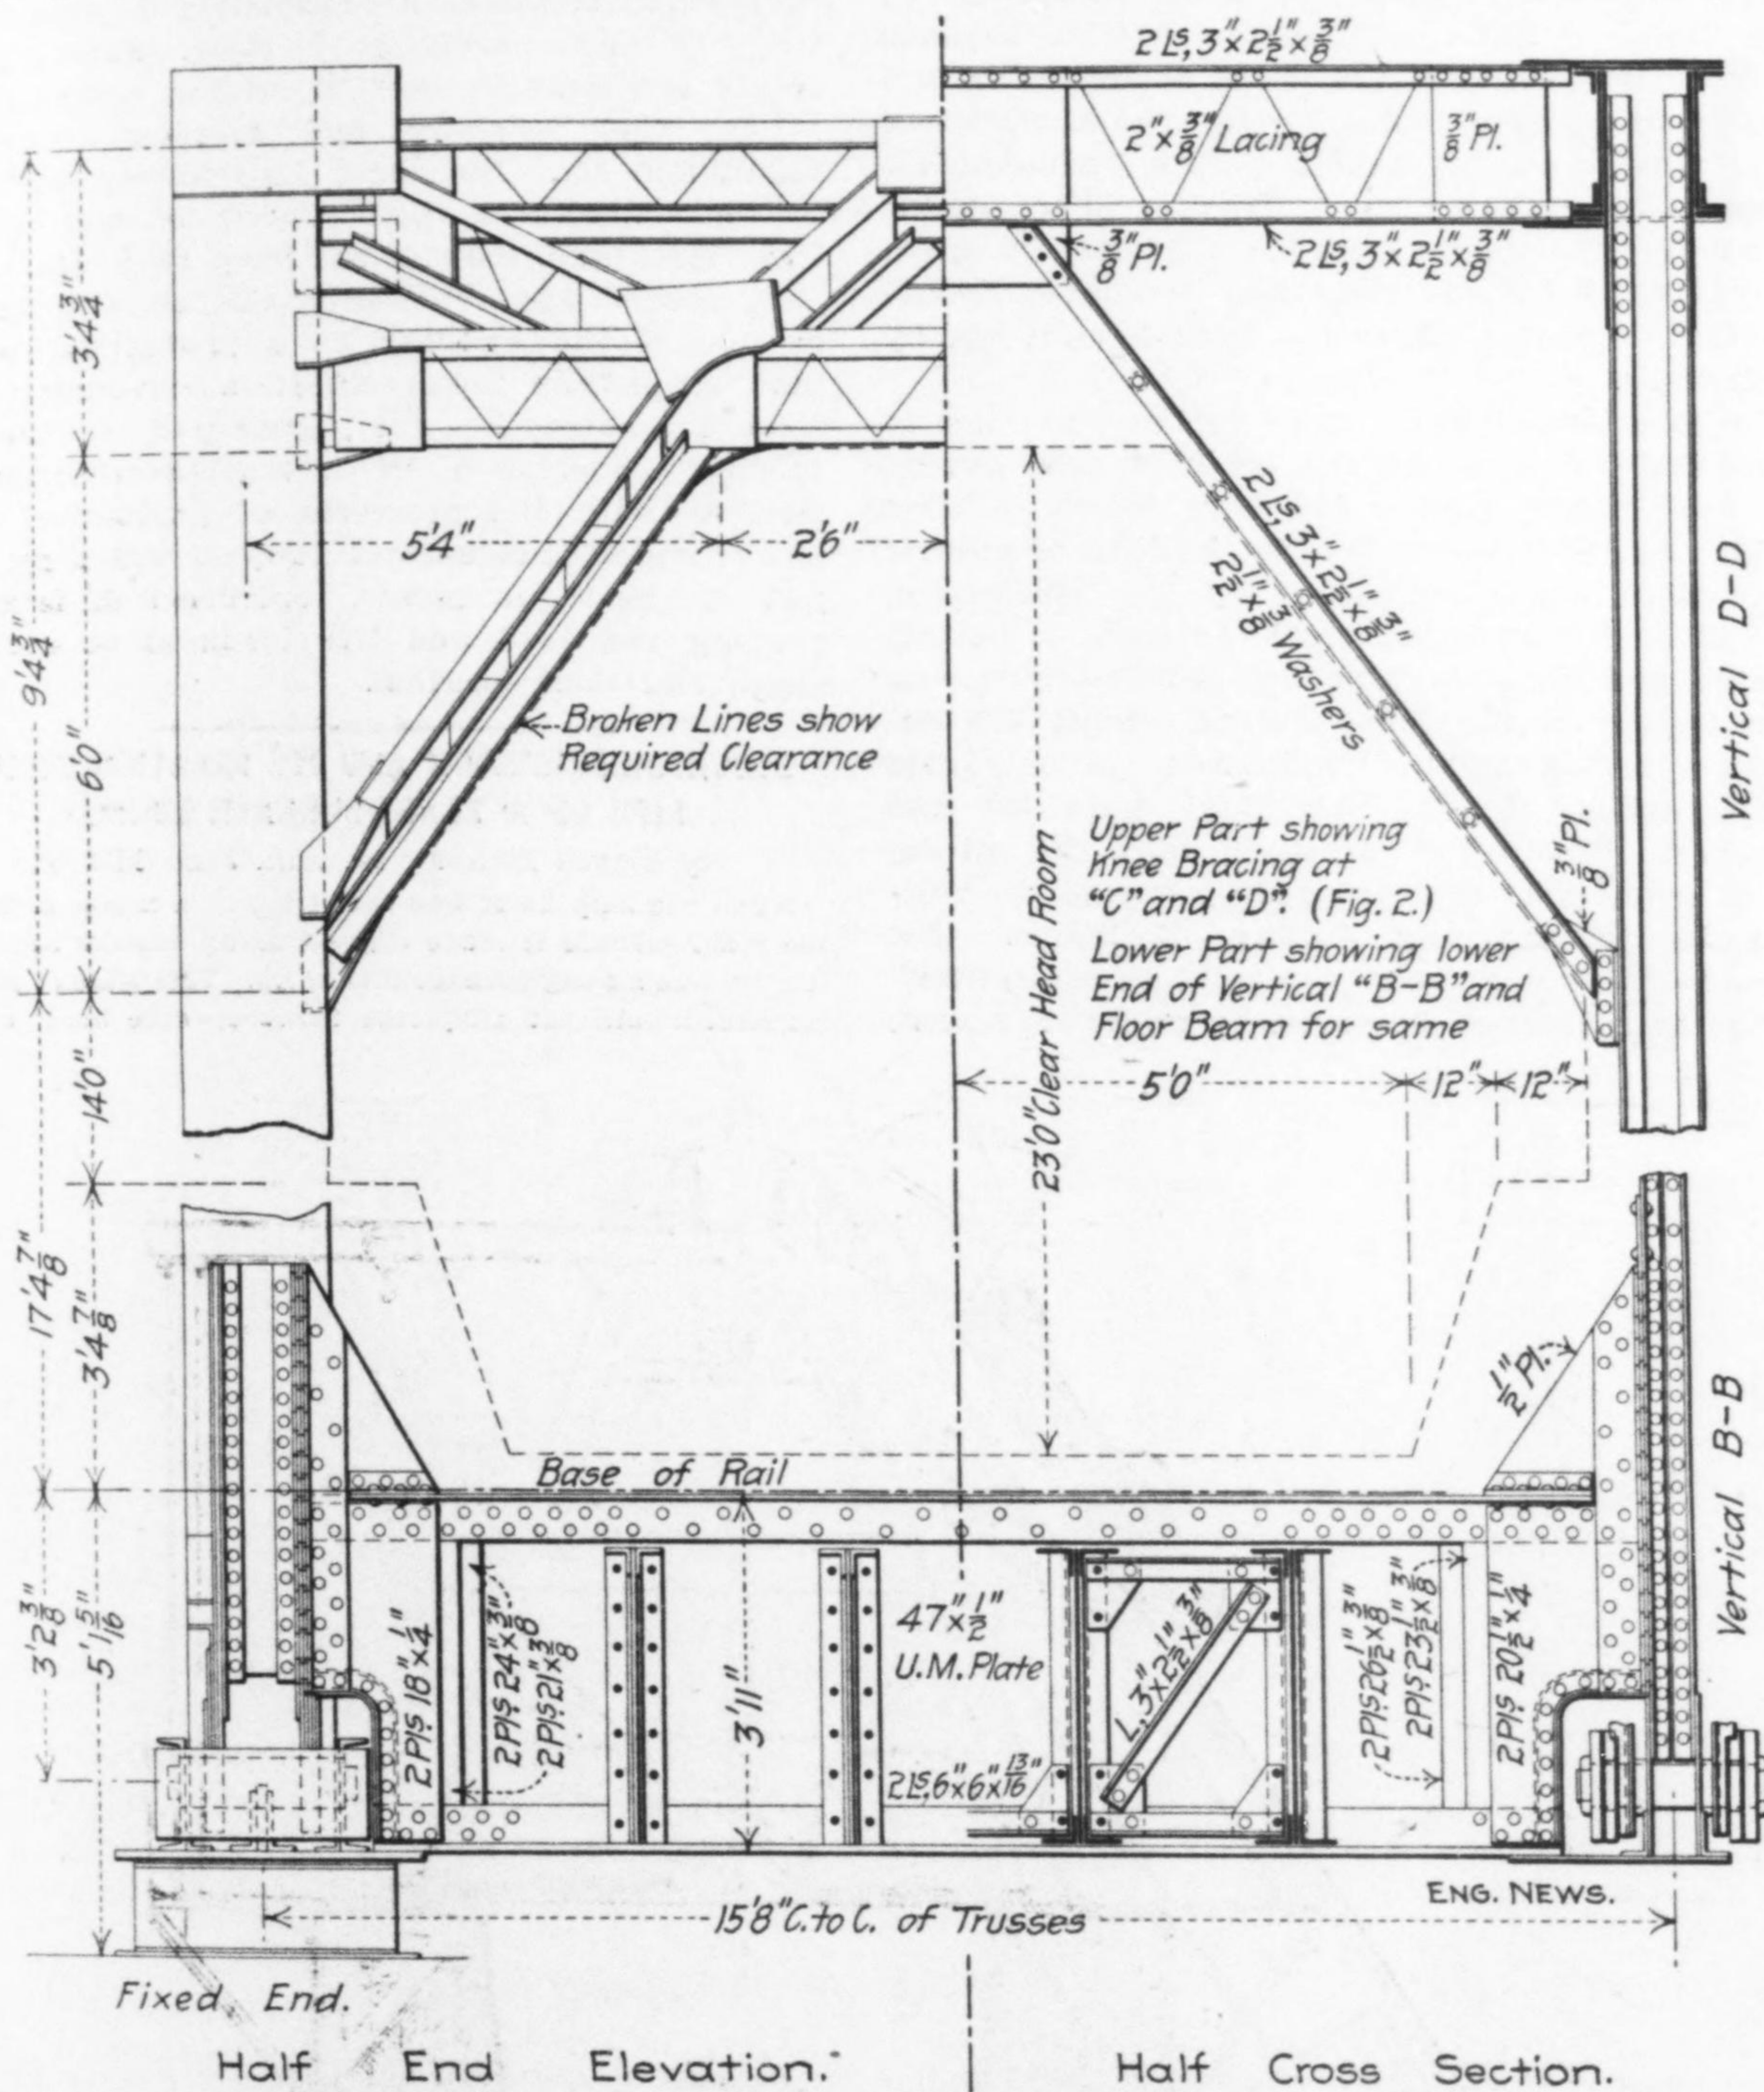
HALF END ELEVATION AND HALF CROSS-SECTION OF SCHAUB TRUSS.
